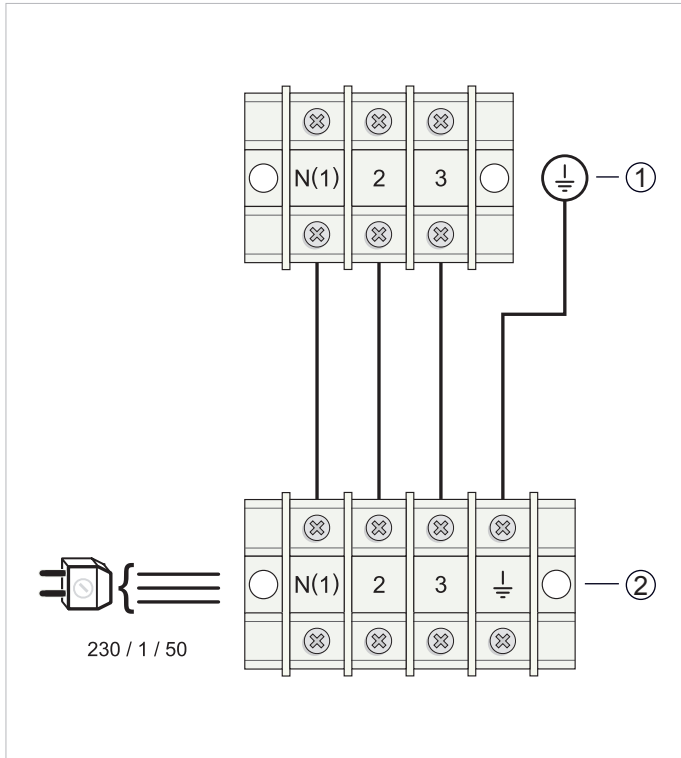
Electrical layout for outdoor and indoor connection SDH 18-025 NW and SDH 18-035 NW.
